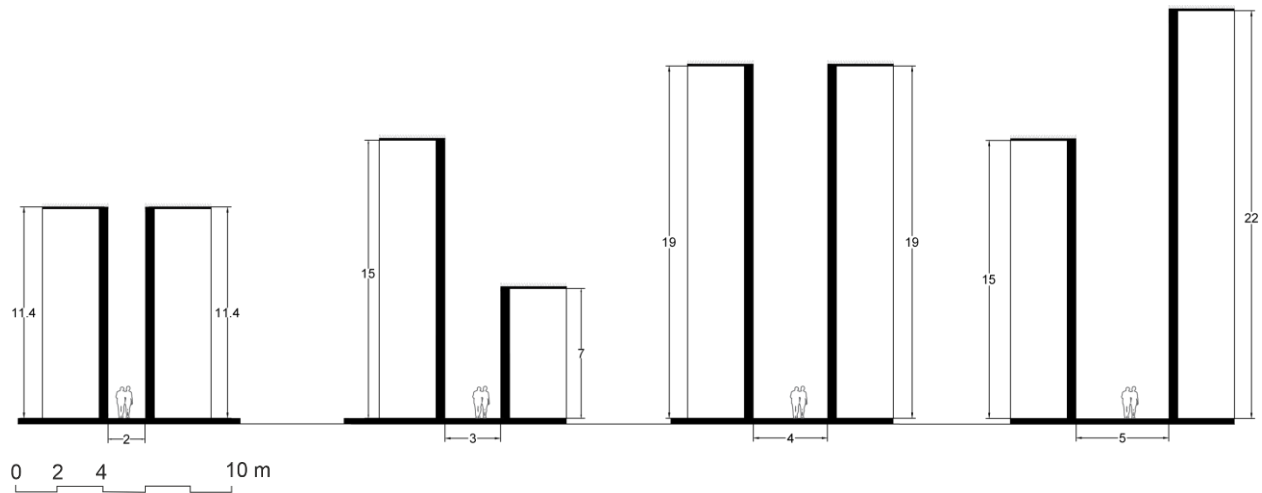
Section samples of streets in the AlBalad layout without the projected windows (Rawashin).
